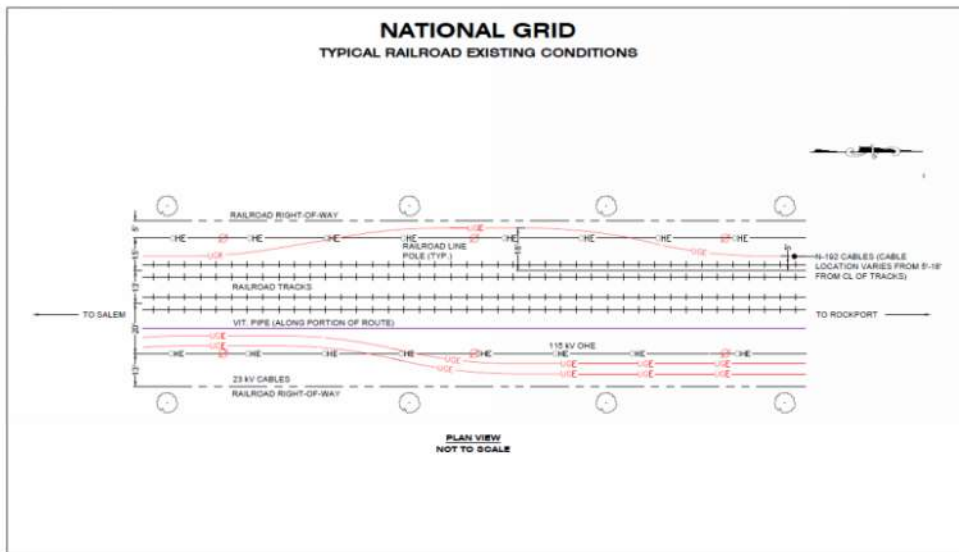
Plan View of Typical Railroad ROW with Existing Conditions
